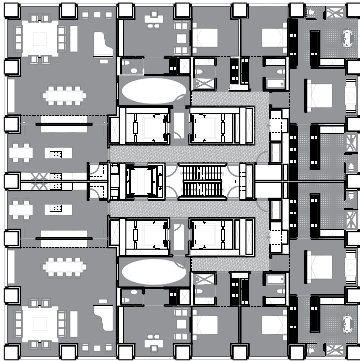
432 PARK AVENUE PLAN. © RAFAEL VIÑOLY ARCHITECTS
